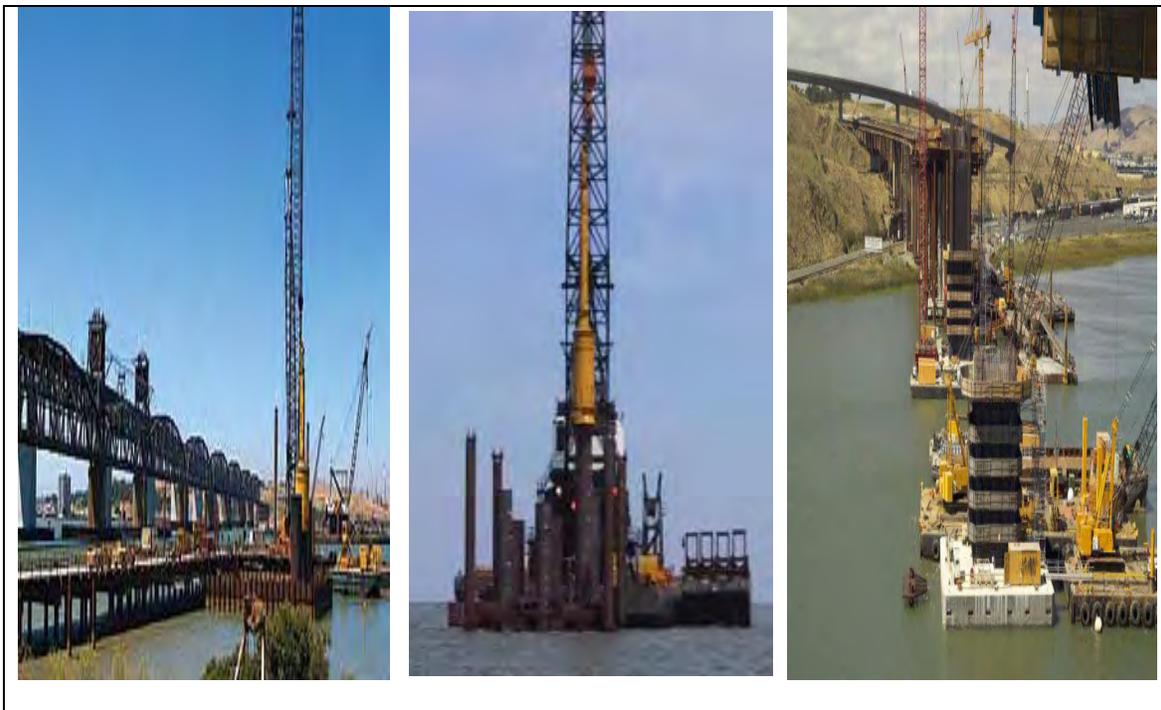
Construction of the New Benicia-Martinez Bridge
